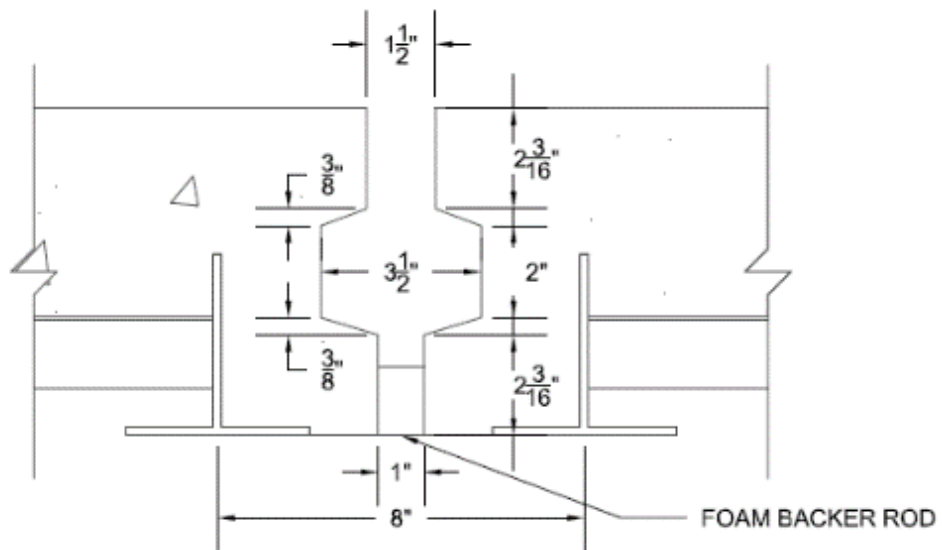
Unreinforced Shear Key Joint Dimensions
